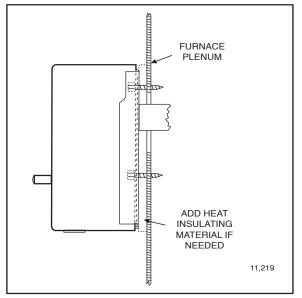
Surface mounting requires a hole 13/16 in. (20.6 mm) diameter for element insertion.
